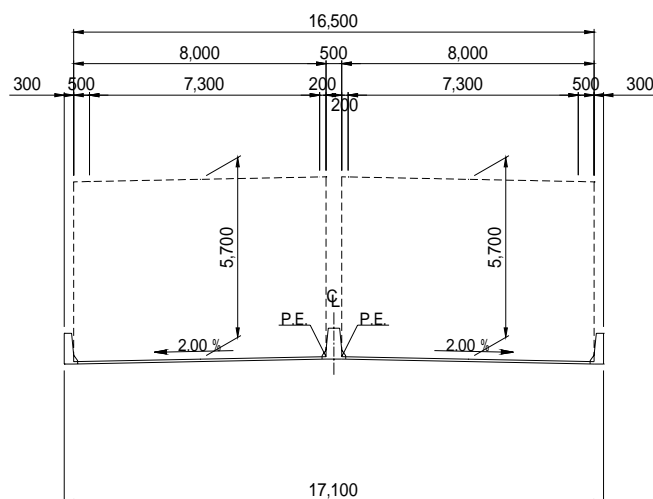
Bridge Cross-Section based on RHD Substandard
